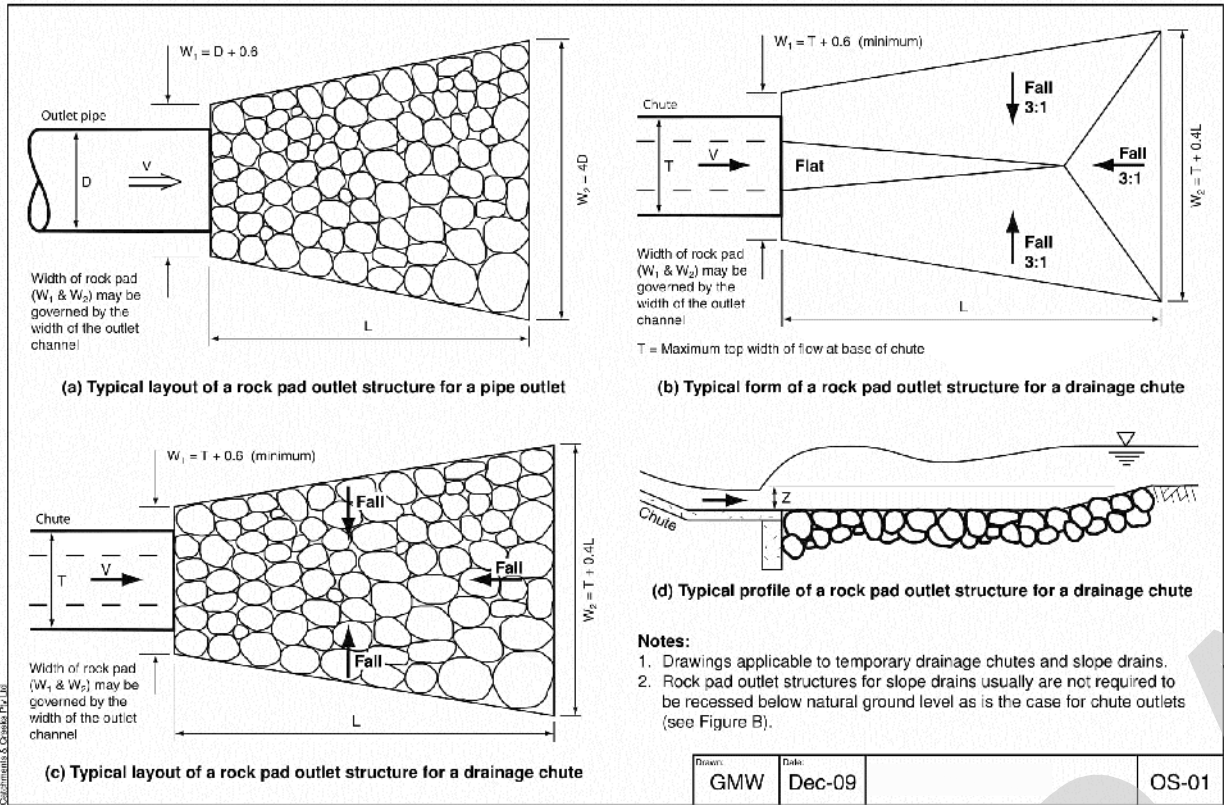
OUTLET SCOUR PROTECTION (FROM IECA, 2008).
